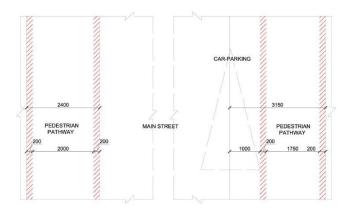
Street width and buffer spaces (in mm) for Gateway 15 in the area surrounding Offenbach am Main Hauptbahnhof
